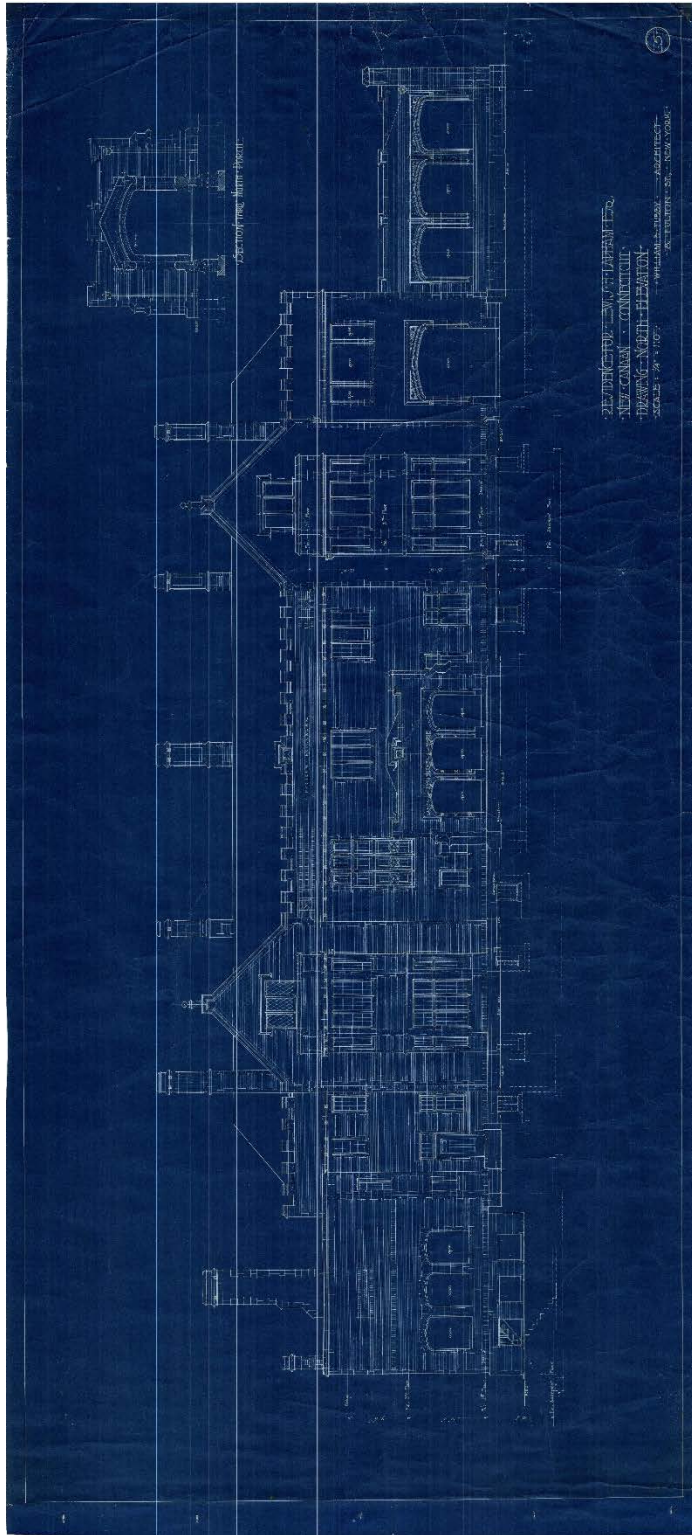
North Elevation drawing of Waveny House (New Canaan Department of Public Works, New Canaan, CT).
